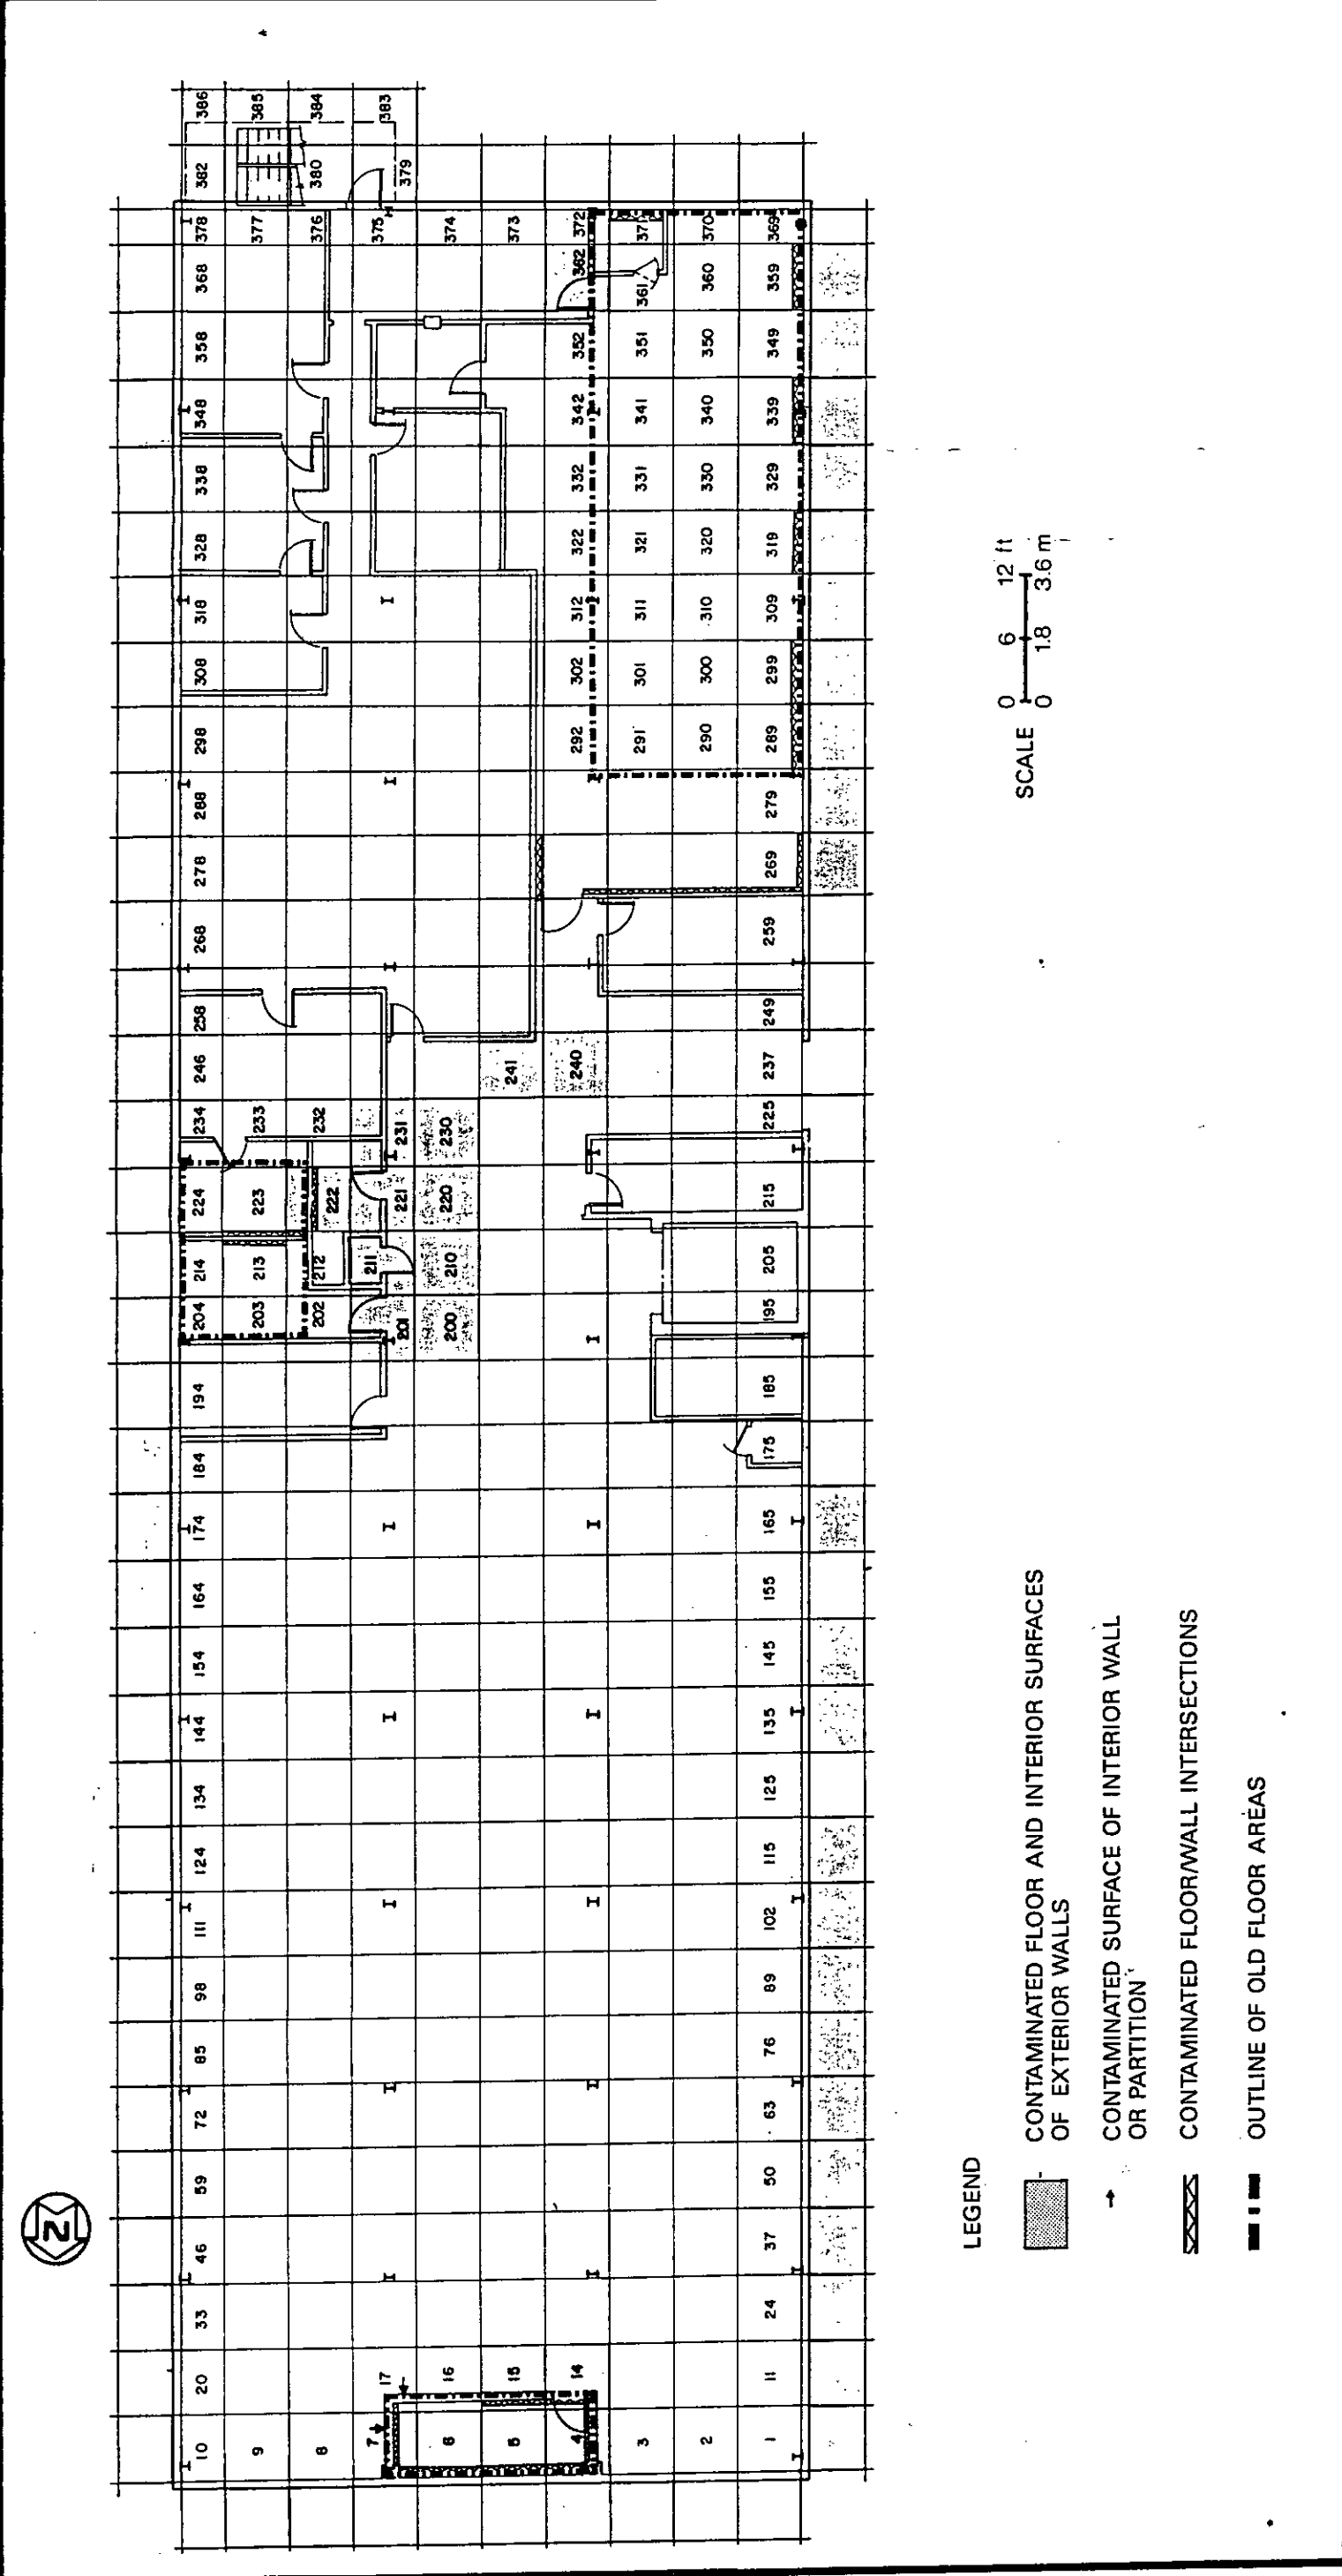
BUILDING 845, SECOND FLOOR: AREAS OF CONTAMINATION ON FLOOR, WALLS, AND FLOOR/WALL INTERSECTIONS
